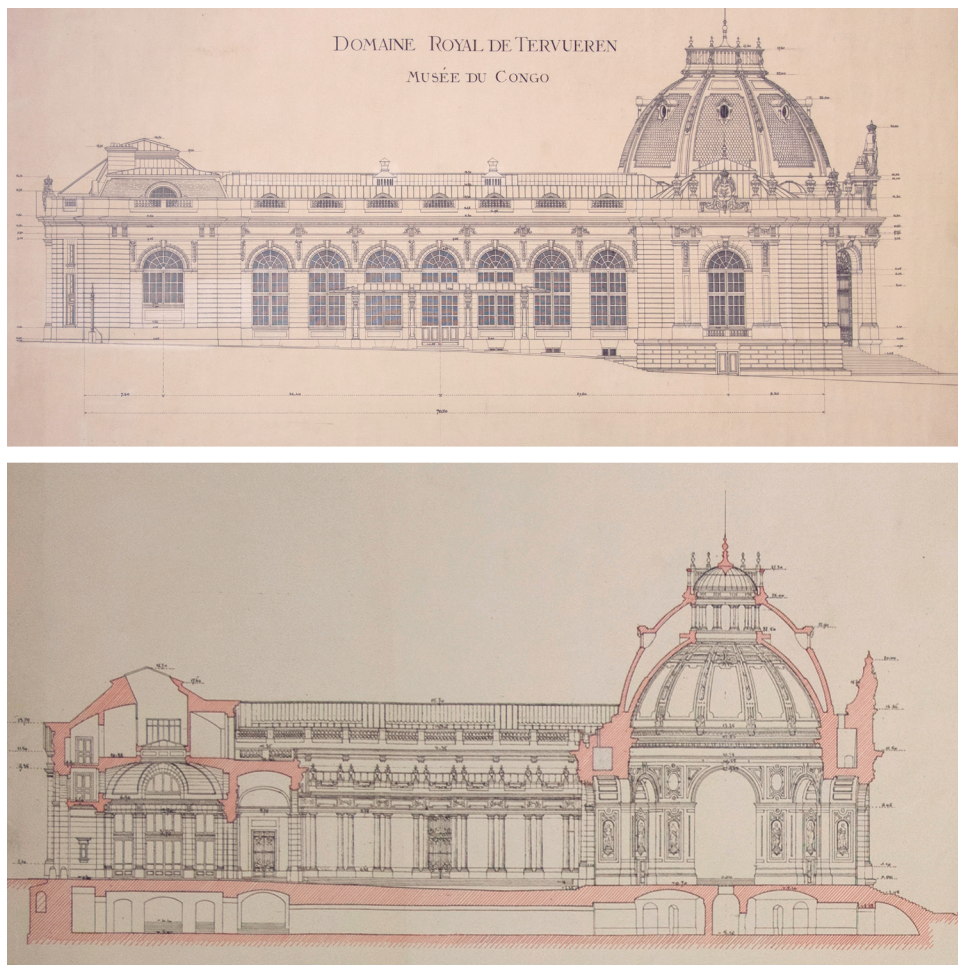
Lateral façade (1909) and section of the Congo Museum (n.d.) (HA.01.0827.18, RMCA Tervuren collection, Charles Girault archives).
